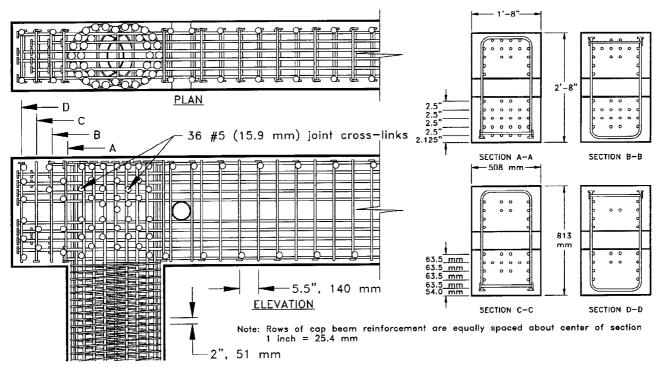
Reinforcement details for the bridge knee joint unit with headed reinforcement.
